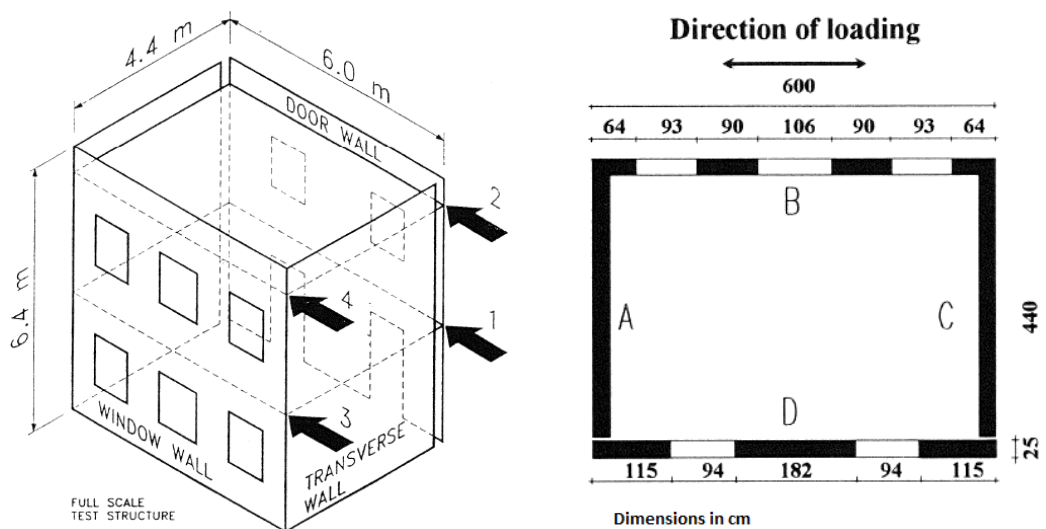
The full scale test structure including loading conditions (a) and the floor plan (b).
